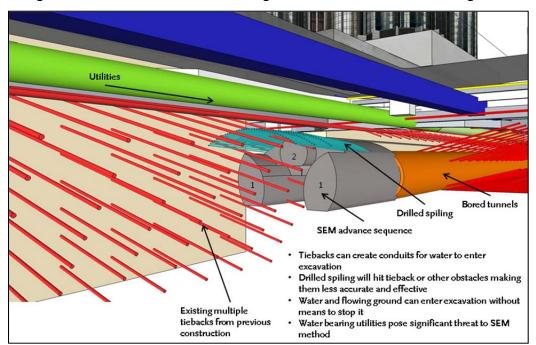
SEM Construction Through Flower Street Tie-backs Looking North
